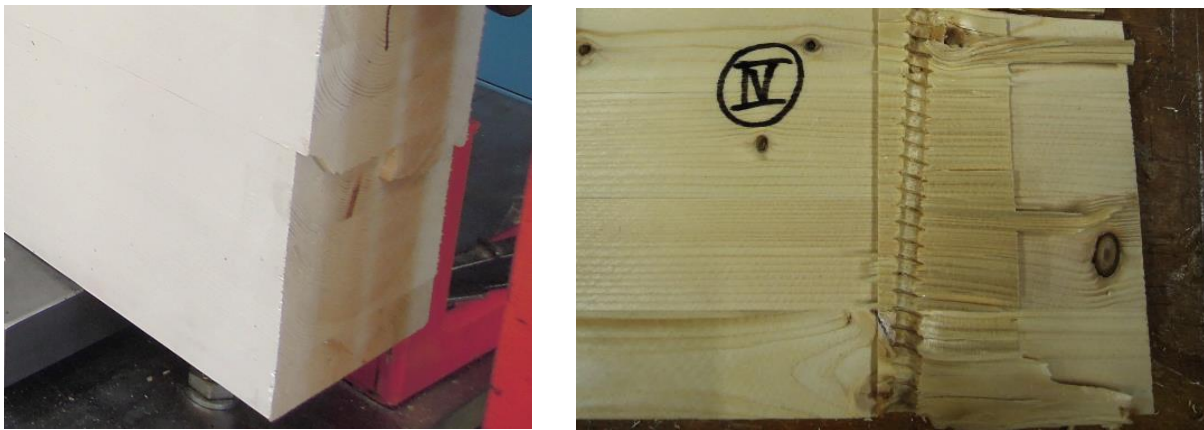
Shear failure on the right edge (left); screw hole (right) of specimen C01
